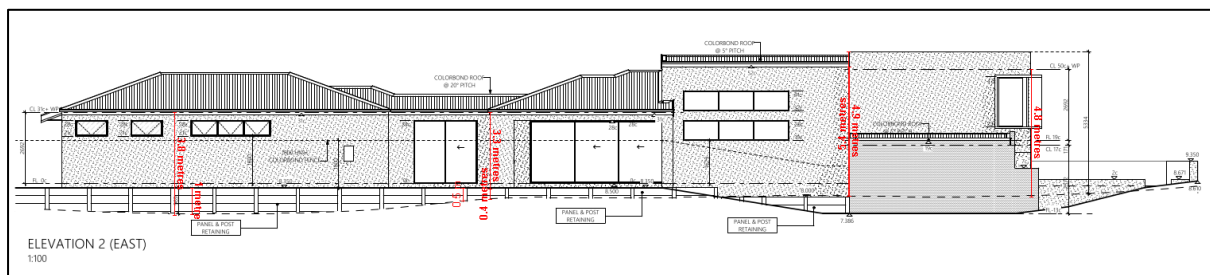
East elevation for lot 880, as viewed from the east adjoining lot 10 Birdwood Road.
